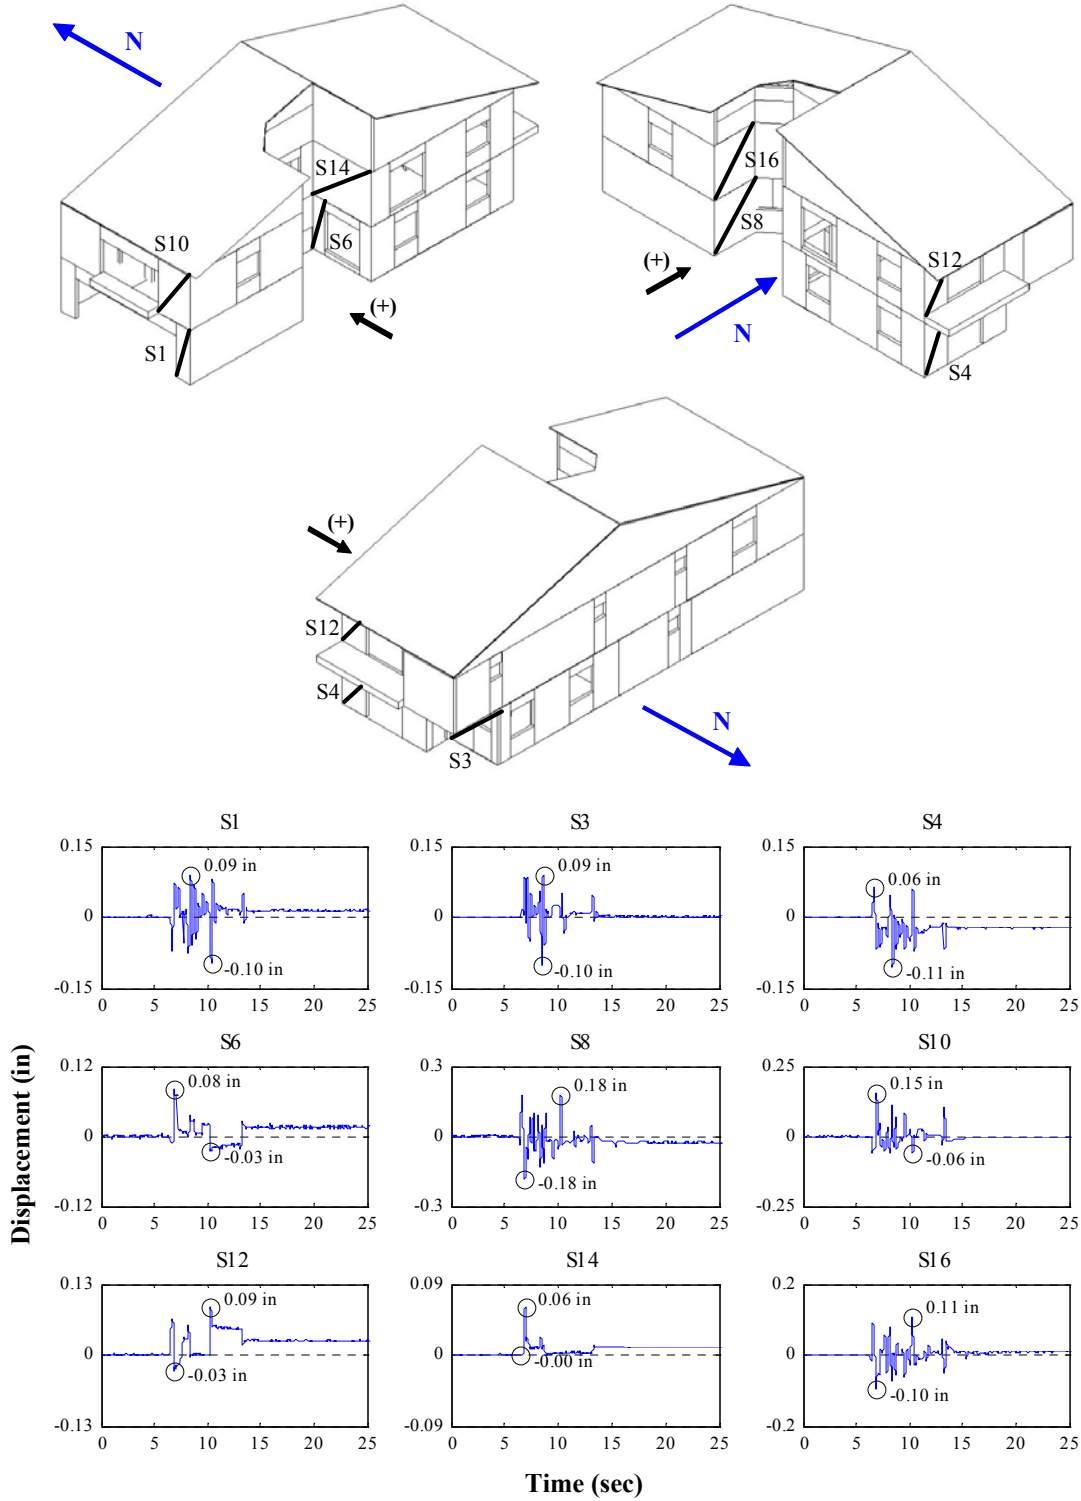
Wall deformations of north-south external walls for Test NWP2S30
